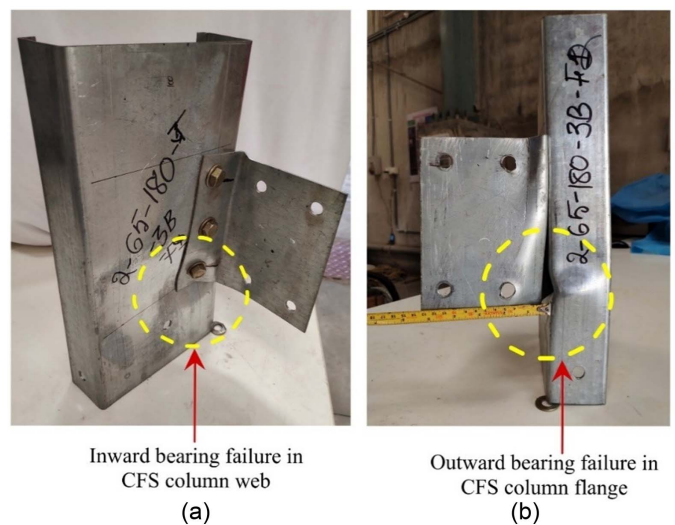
Column bearing failure: (a) inward bearing failure in CFS column web; and (b) outward buckling of CFS column flange.
